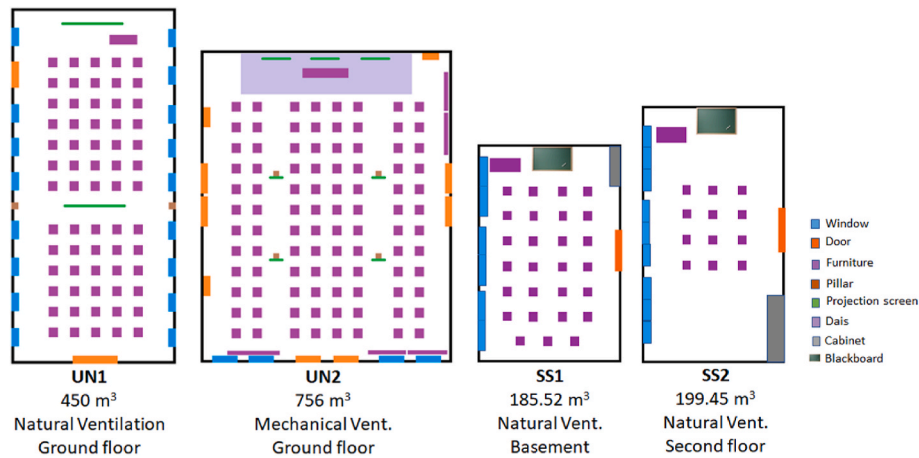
Schematic floor plans of the university (UN1, UN2) and secondary school (SS1, SS2) classrooms.
